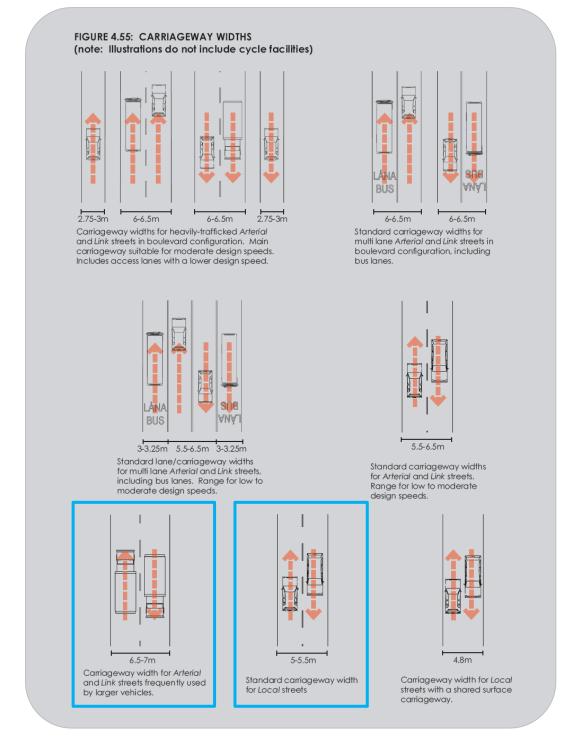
Carriageway Widths (source: Design Manual for Urban Roads and Streets)
